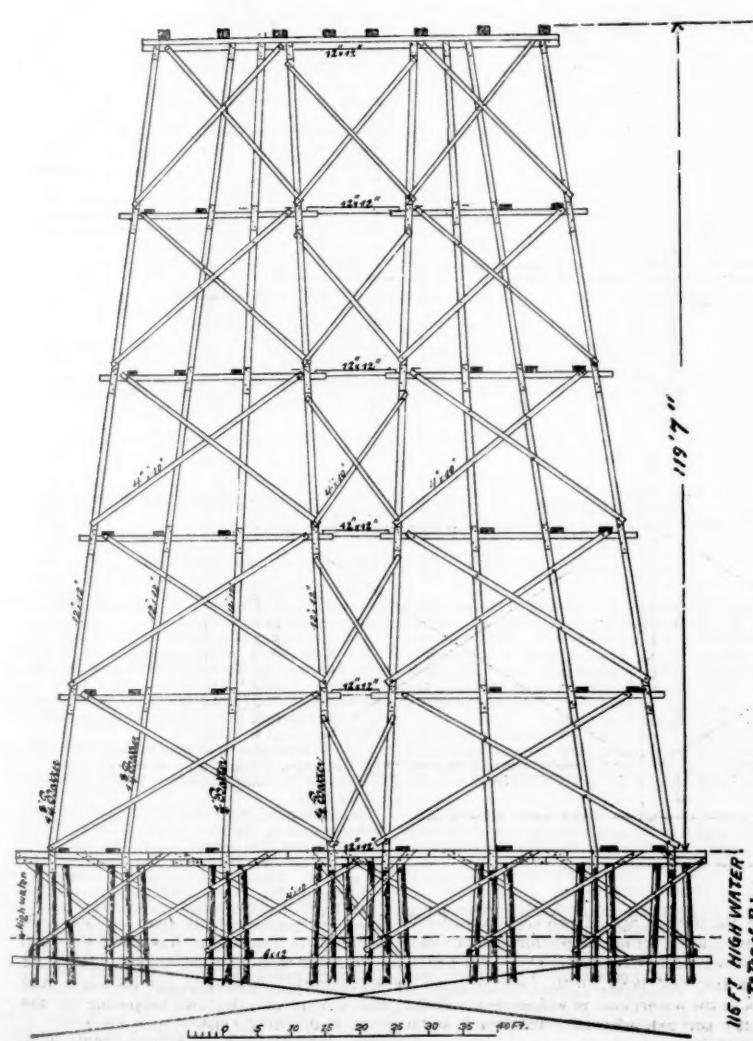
False Work for Erecting 509-foot Connecting Span.
